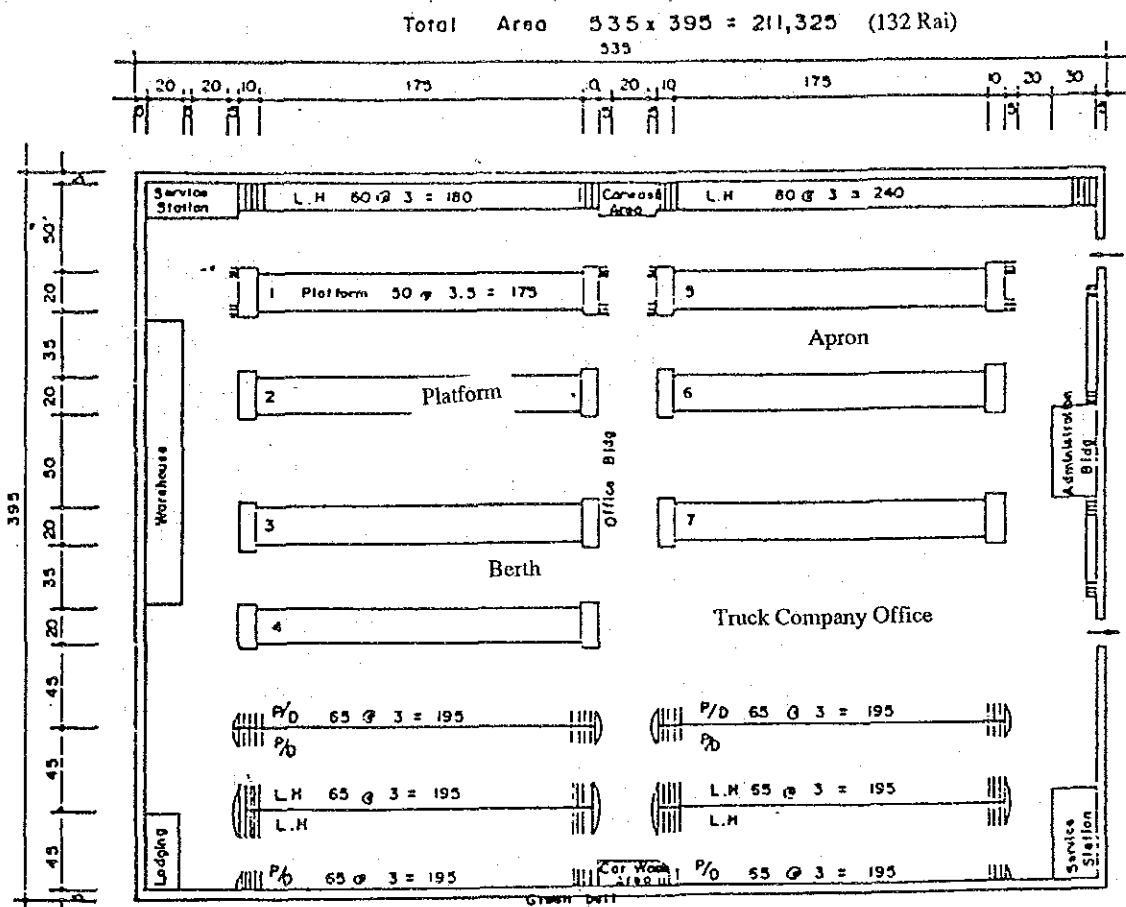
Recommended Layout Plan and Necessary Facilities (Case 2; 350 Berth)
